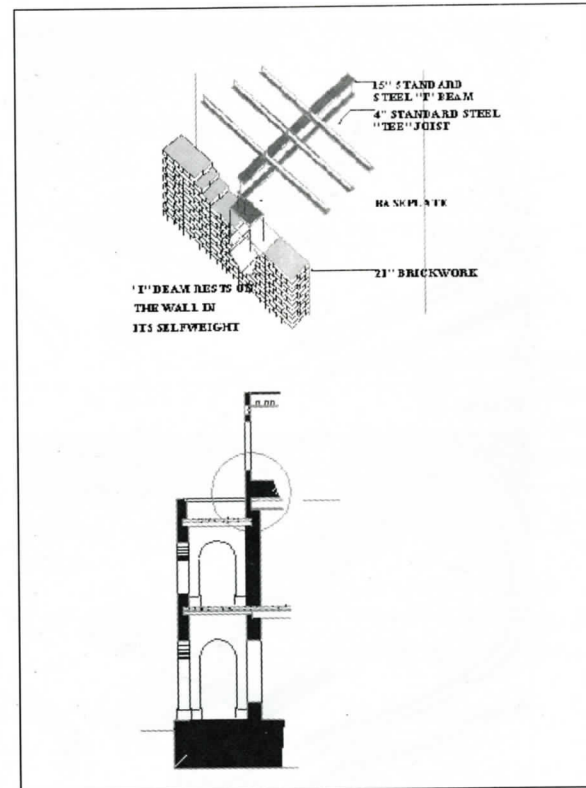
Joining Details of 'I' Beam in roofing and Load Bearing Walls
